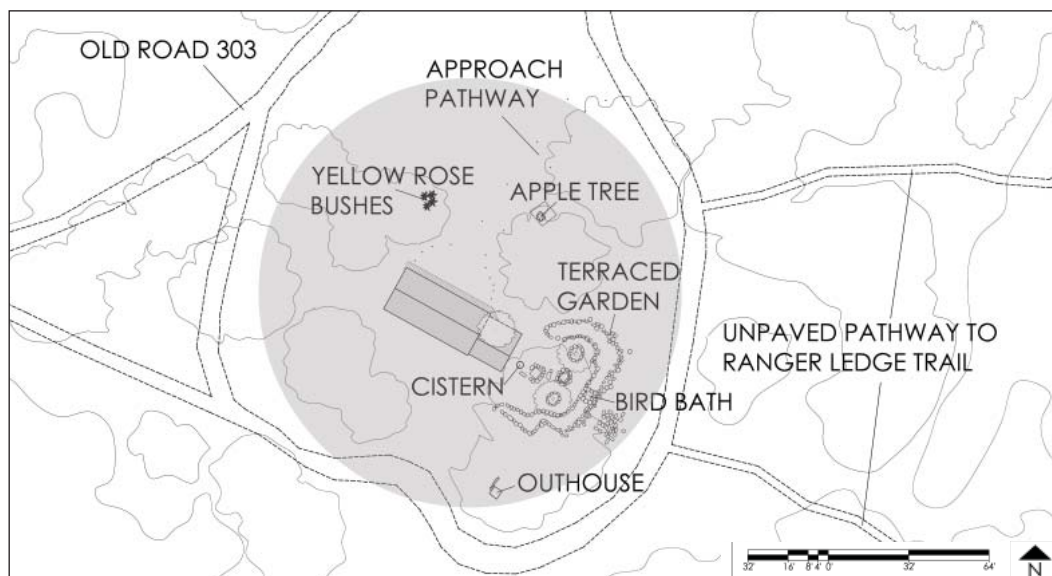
Site plan showing approach to the Ranger Cabin and site features; shaded area discussed in detail
